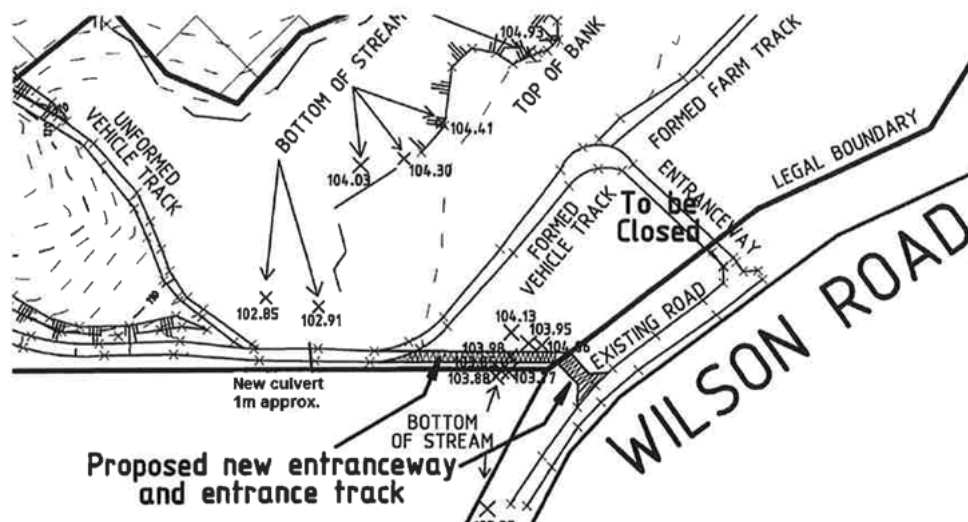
Diagram of location of new access track and culvert (See Appendix 2 for enlarged diagram).
